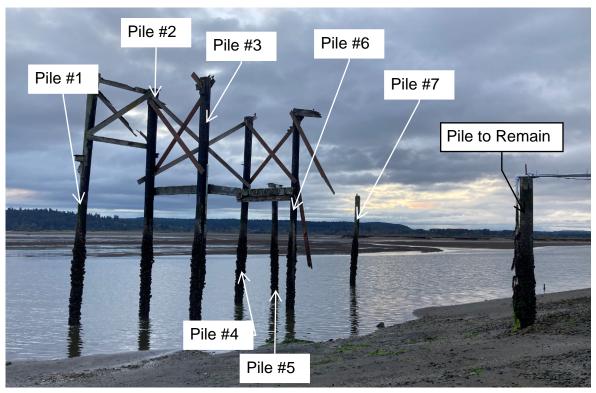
Creosote Piling, associated bracing and bird houses to be removed and disposed of properly. Seven (7) in water piles remain.
